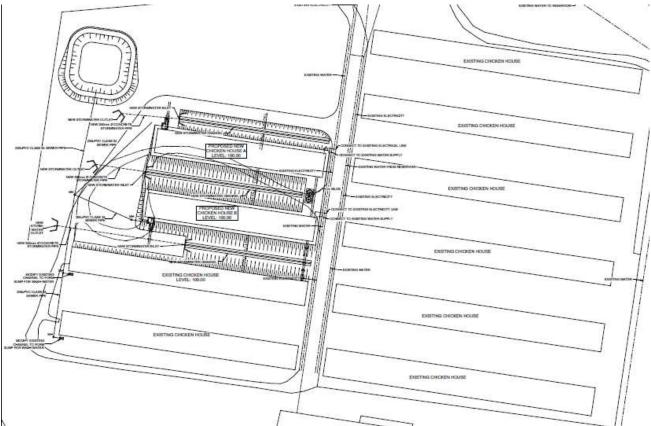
Diagramme showing six (6) lay houses constructed prior to Environmental Regulations (on the right side), as well as the two (2) ones constructed without prior EA (left bottom) and the proposed two (2) new lay houses (not yet constructed), along with an evaporation pond for runoff washwater.
